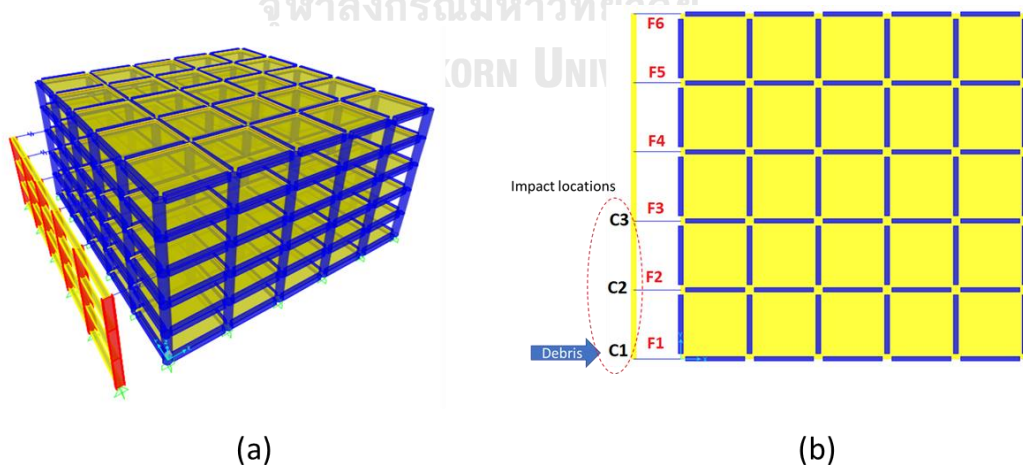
Building with fenders (a) 3-dimension view and (b) plan view
